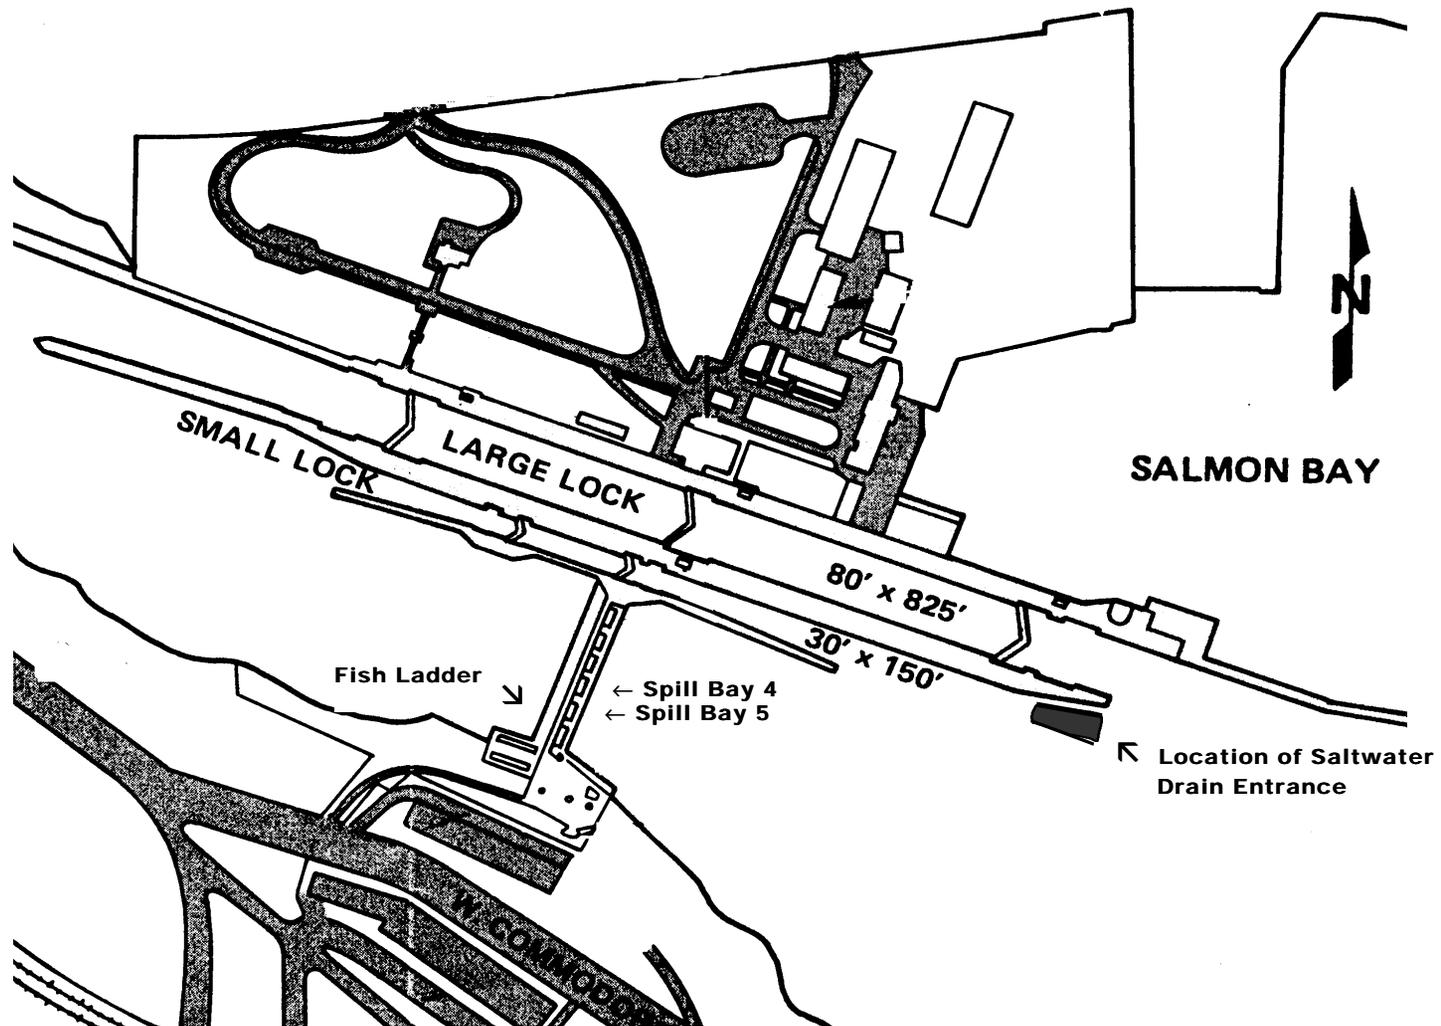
Plan view of the Hiram M. Chittenden Locks showing major structural features and location of tunnel readers in spill bays 4 and 5.
